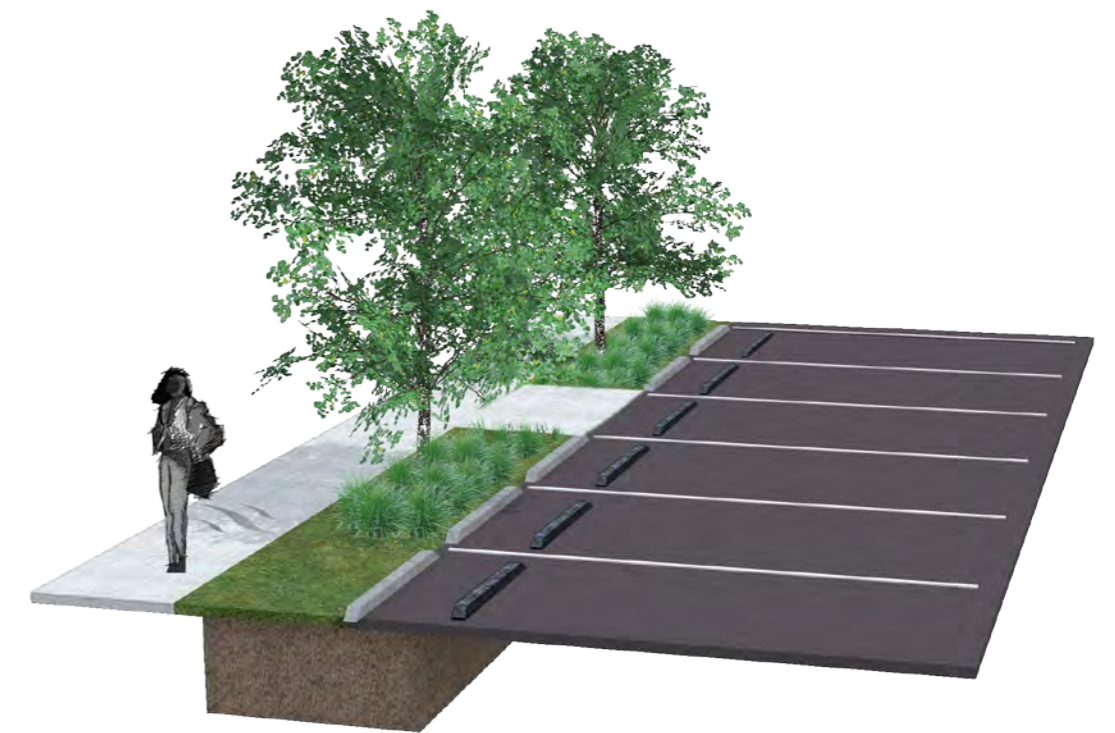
TYPICAL STREET TREE PLANTING - THOMPSON STREET
